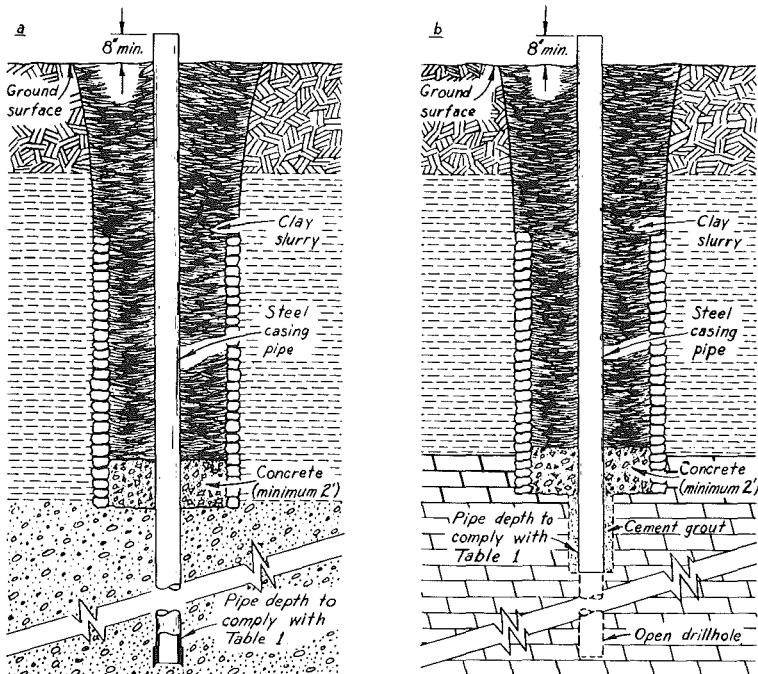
Drilled Well Constructed in Existing Dug Type Well. See NR 112.12.
